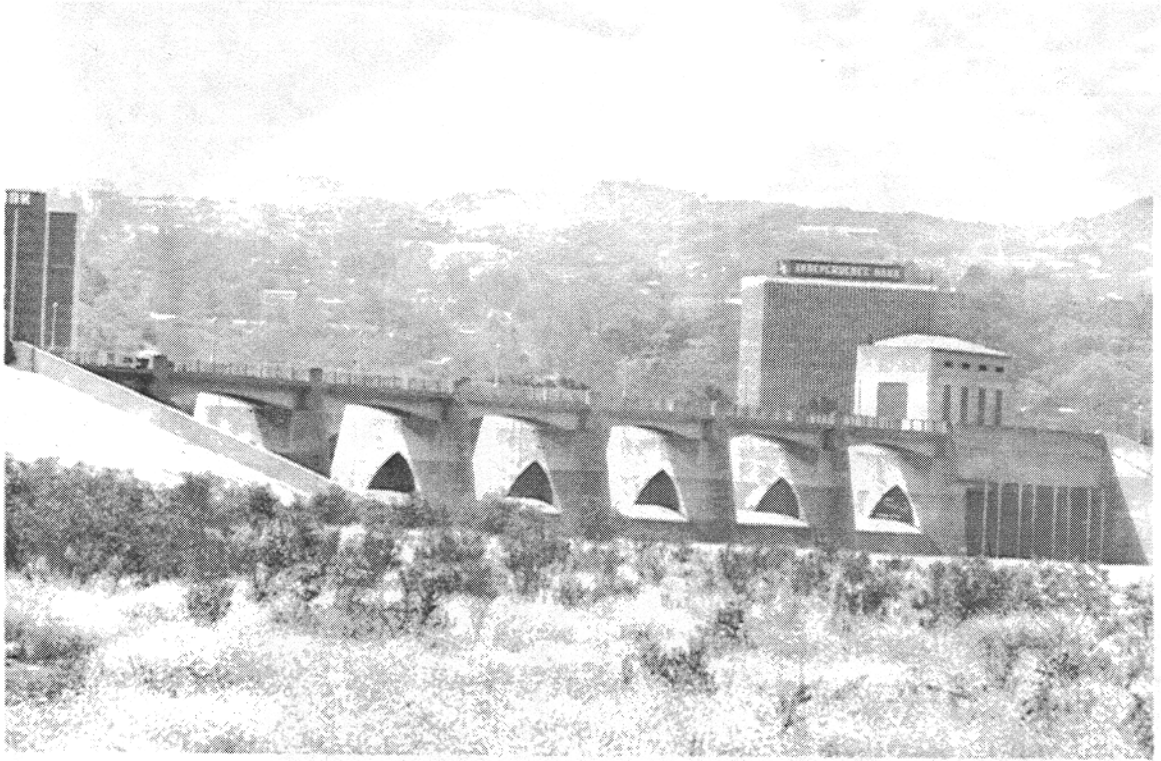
Control House (right) and Spillway (view from upstream, with reservoir.)
